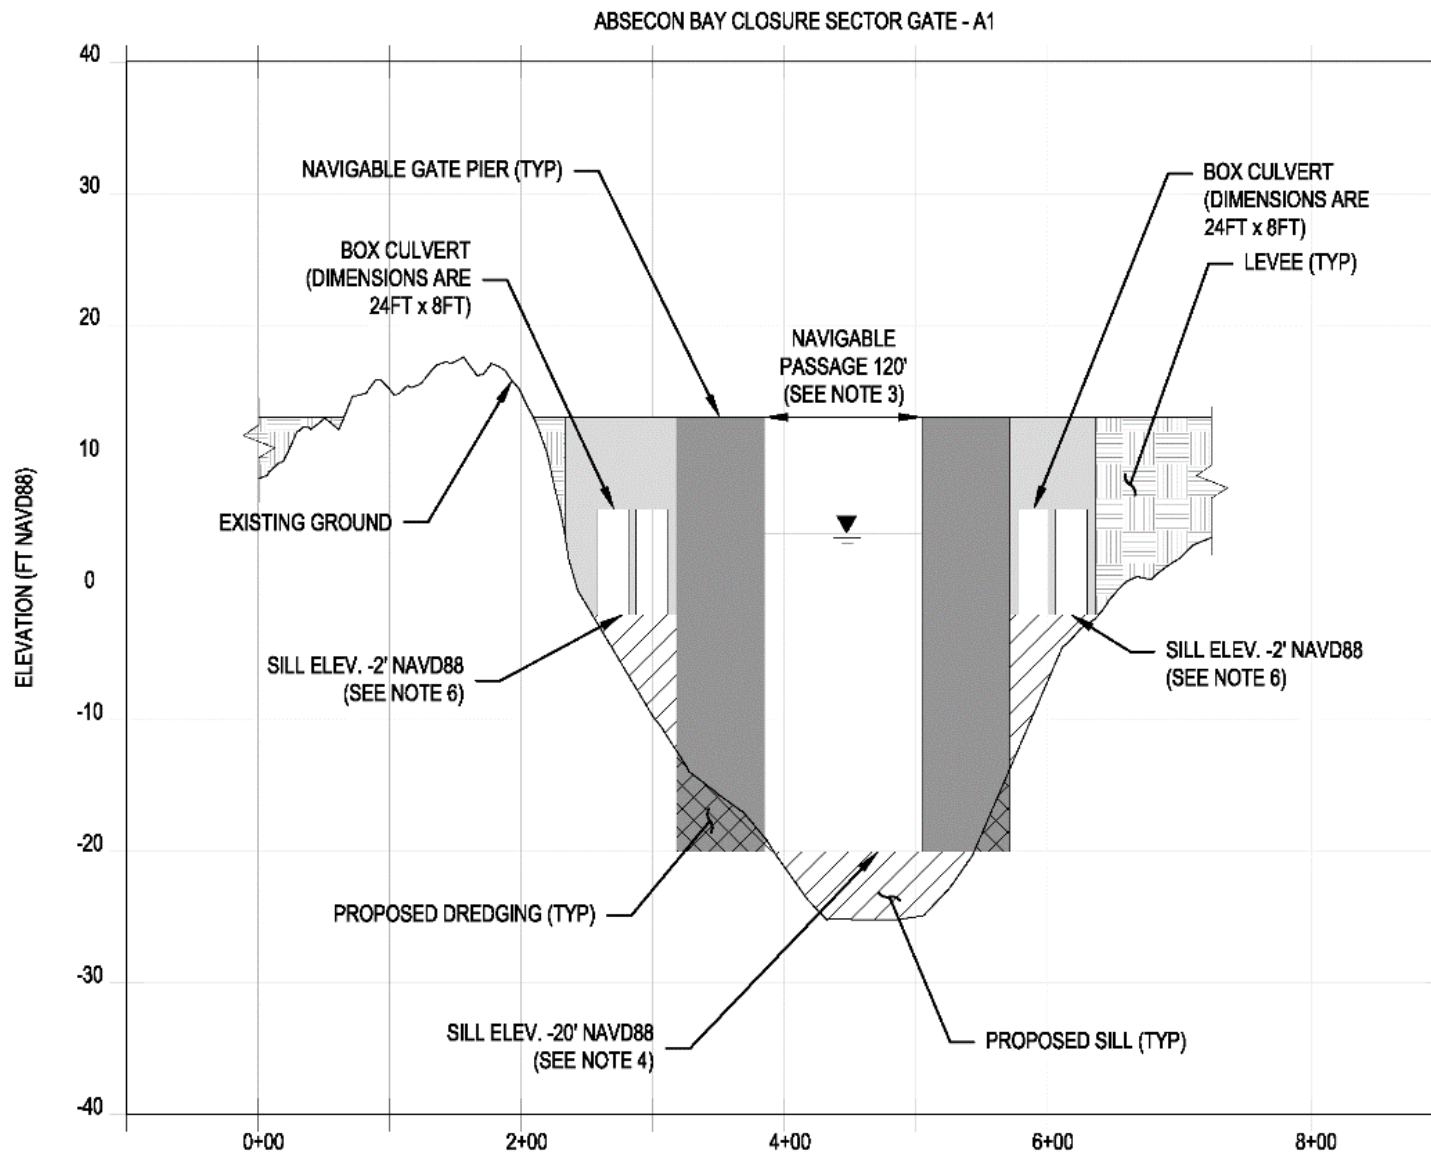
Absecon Blvd. Cross-Bay Barrier (Bay Closure) A-1 Navigable Gate Cross Section
